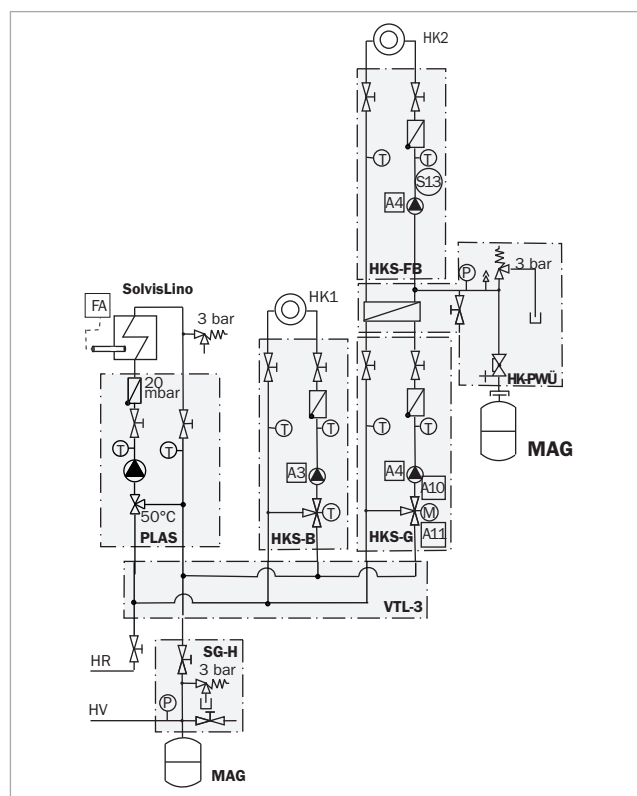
Pellet boiler SolvisLino with HKS-B and HKS-G on distributor bar VTL-3
